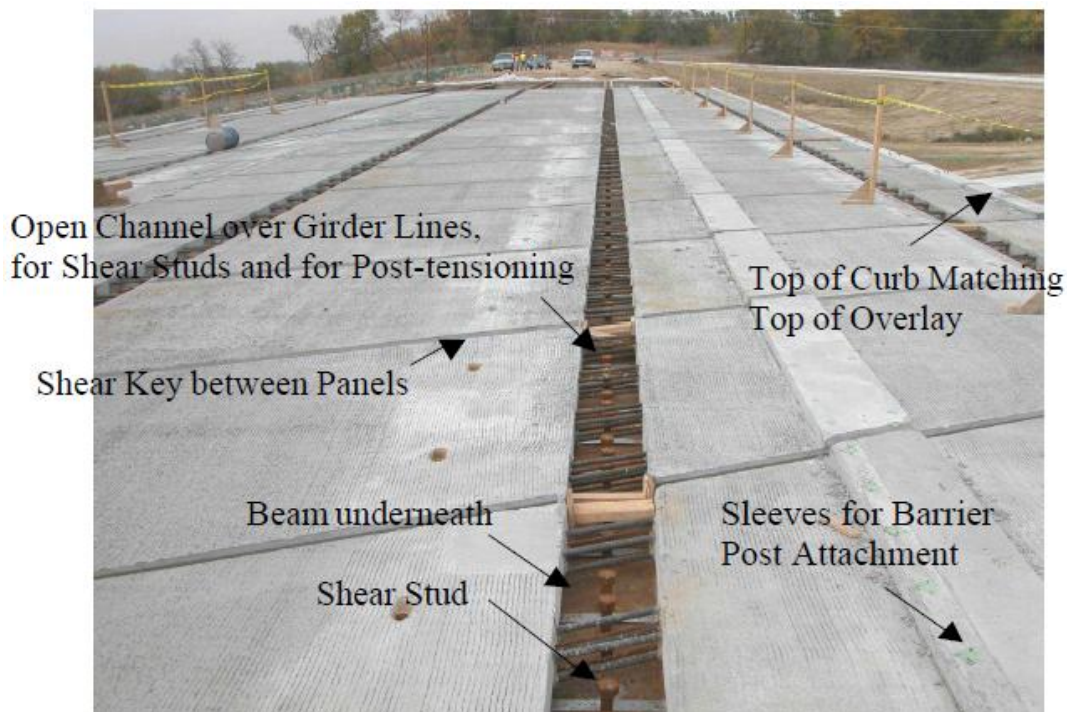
Skyline Bridge after Placement of Precast Panels (Sun, 2004)
